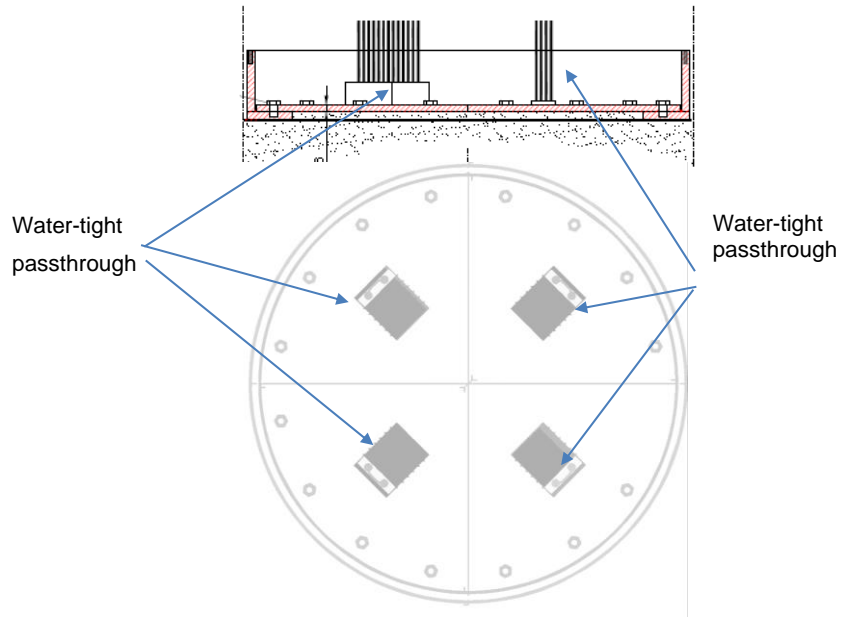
Scheme of the bottom plate of the cables sealing lid below the confining tube in Shaft 2
